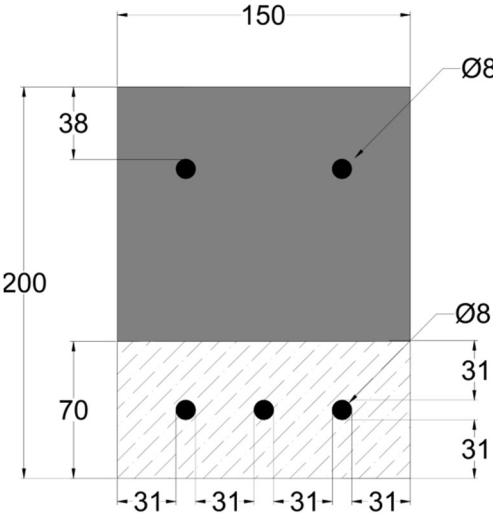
cross-section of a reinforced hybrid beam containing an SHCC layer (Huang, 2017)
